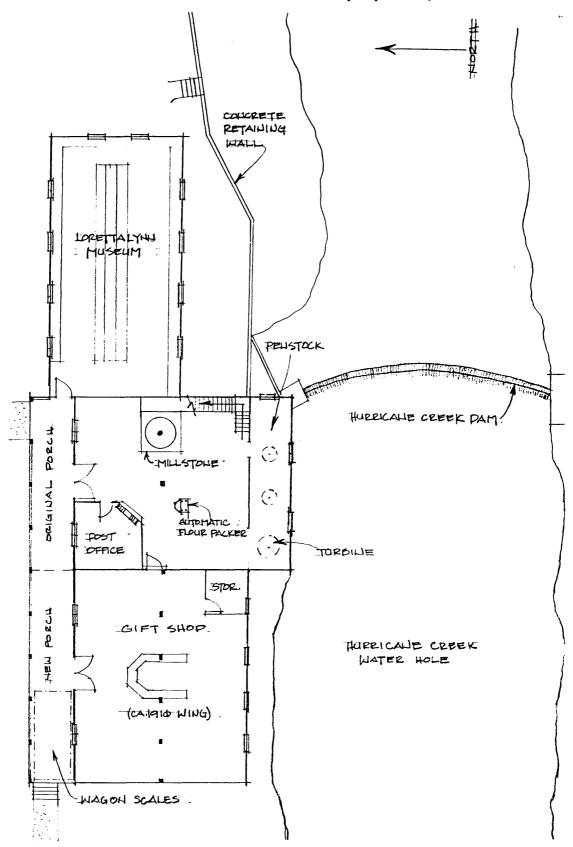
The main floor plan of the Hurricane Mill (HS.12) showing the location of the water level penstock with turbines, as well as the Hurricane Creek Dam (not to scale).
